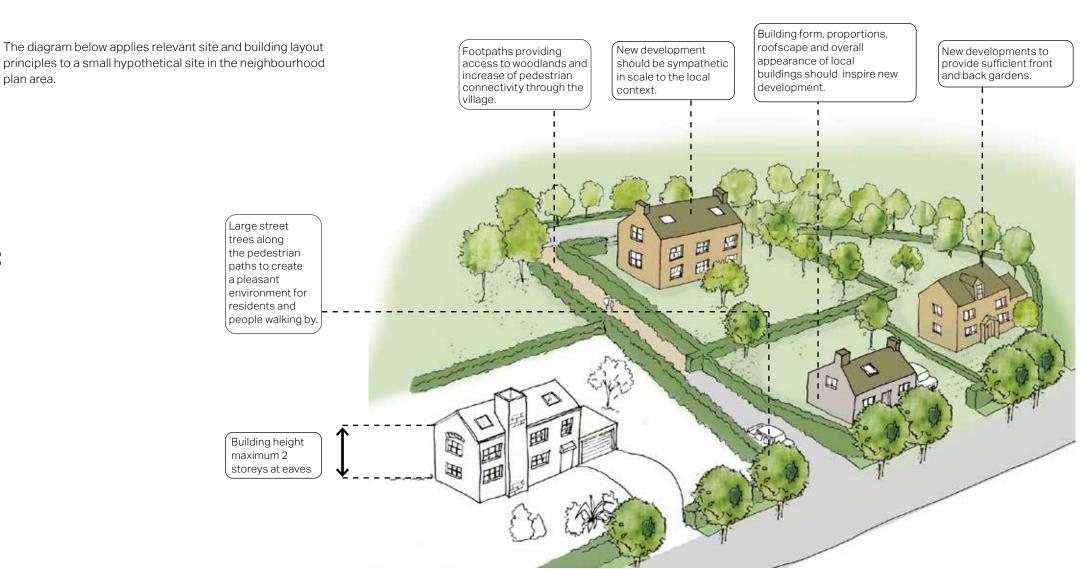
Illustrative plan for a small hypothetical development highlighting many of the elements of the Hove Park Ward design guidelines where they relate to the pattern, layout and massing of buildings.
